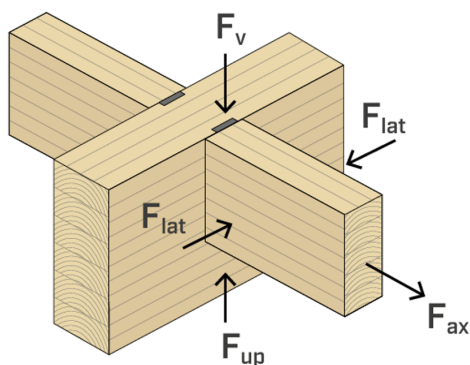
Connection CLT ribs and glulam beam with steel connector [78]
